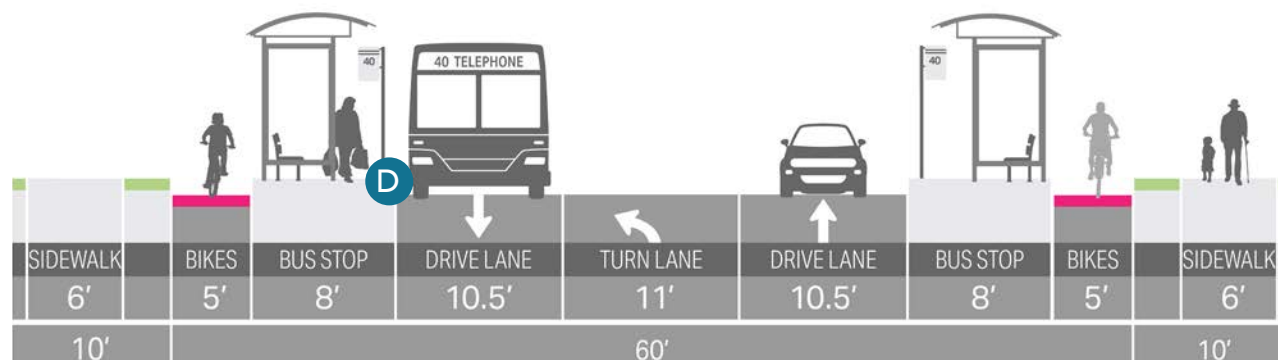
Polk Street Typical Cross Section with Floating Bus Stops
